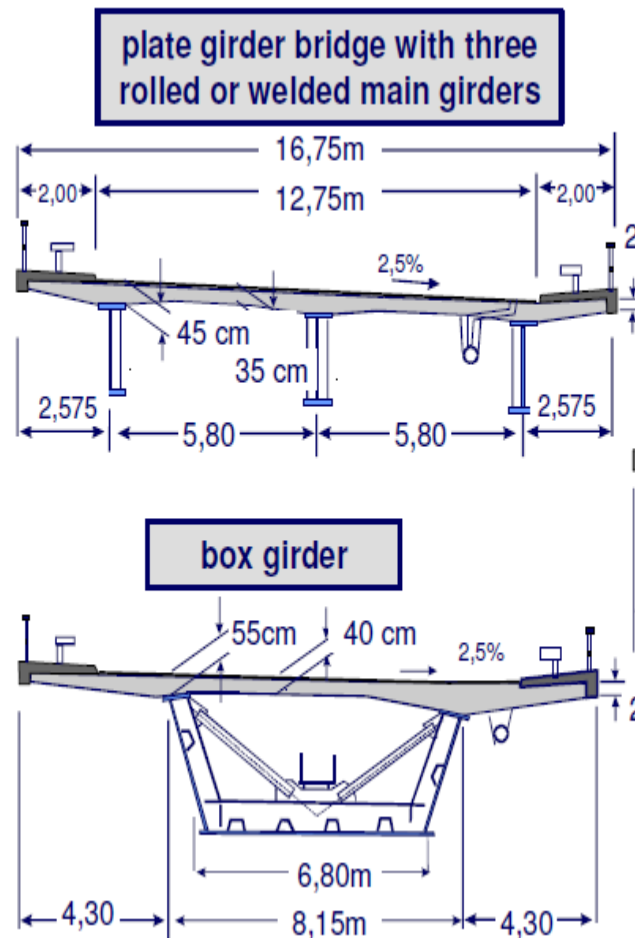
Common Cross-Sections for Typical Composite Bridges for Freeway Bridges [5]
